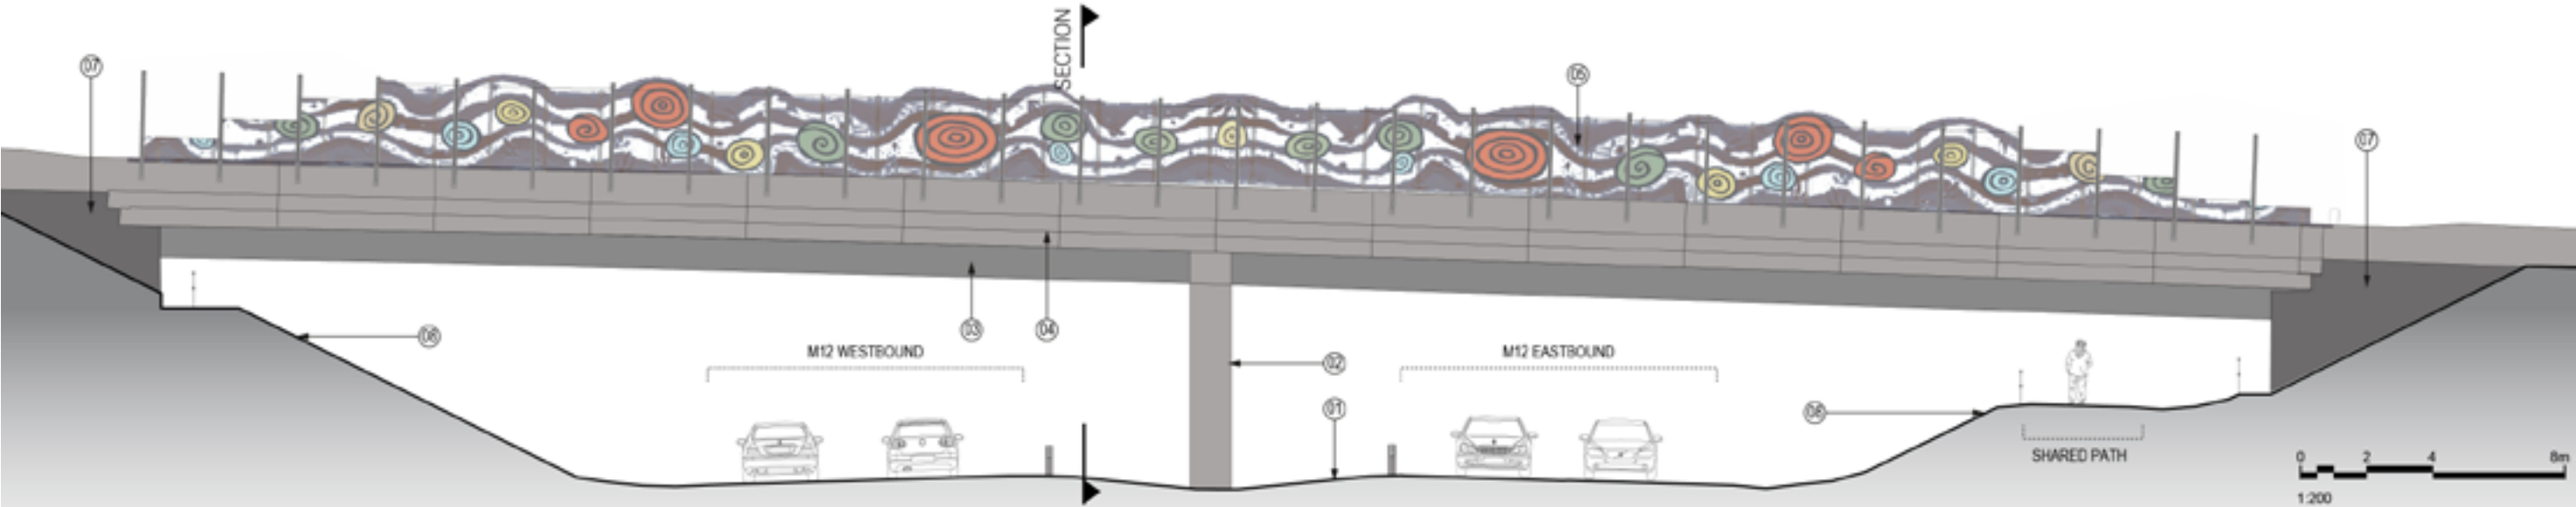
Elevation - BR07 - Clifton Avenue overbridge
